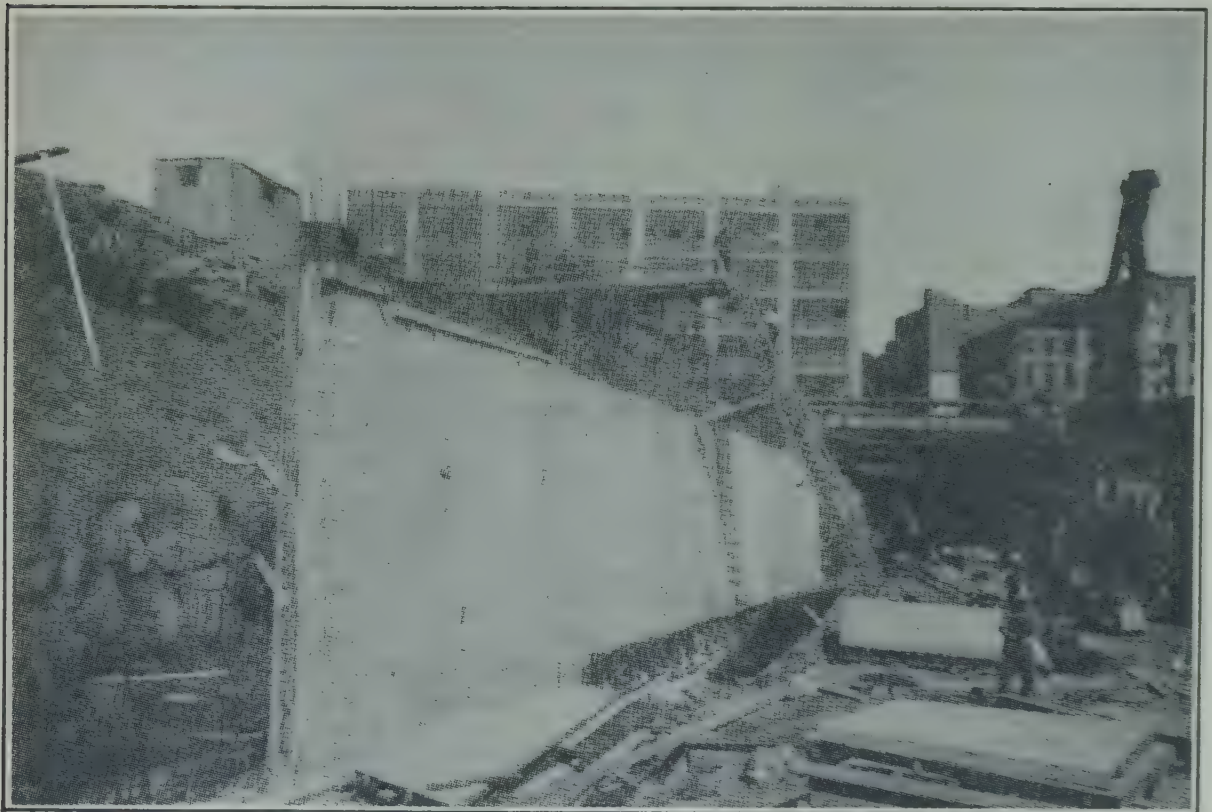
Partially completed retaining wall, Exit Plaza of the Lincoln Tunnel, New York City.
